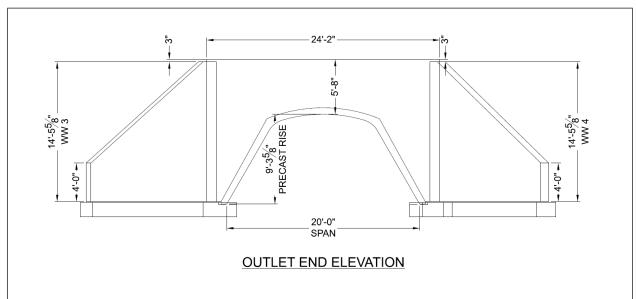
Bottomless Culvert Outlet—Elevations and Dimensions
